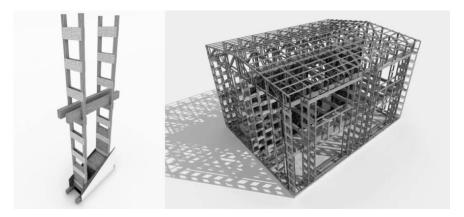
Example of a truss structure of a passive house made of wooden trusses. In the gaps between the trusses, space is created for thermal insulation (lightweight mineral wool), which fills almost the entire building envelope.
